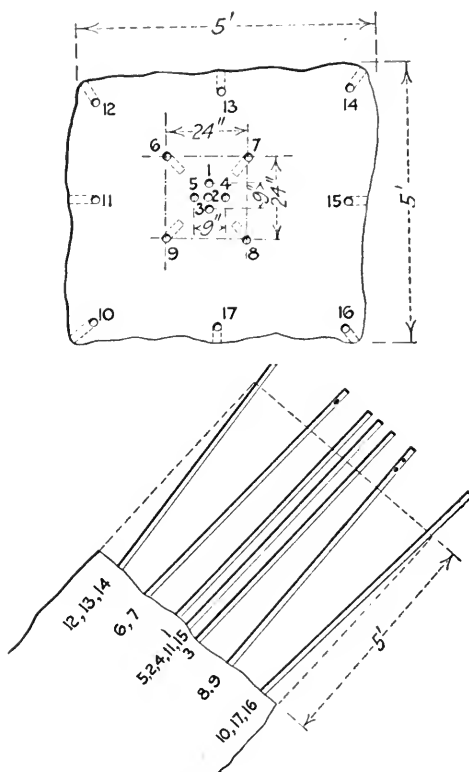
LAYOUT OF HOLES FOR FIVE-HOLE-CUT RAISING.
